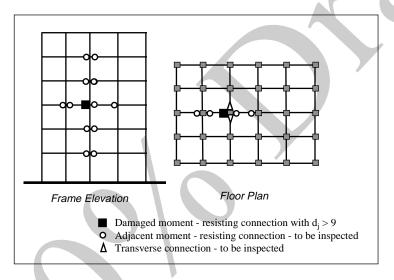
Inspection of Connections Adjacent to Damaged Connection  $(d_j \ge 9)$
